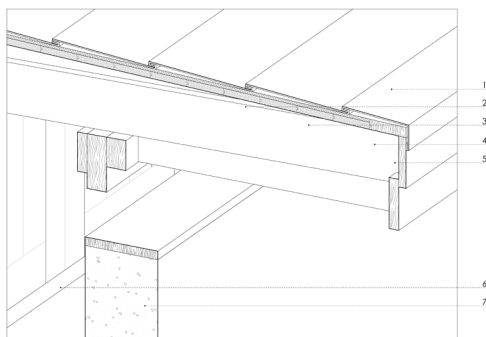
Didactic model of a detail of the Ocean Swimming Pool. Credits: The authors. 1– Bituminous membrane with copper coating; 2 – Waterproofing; 3 – Agglomerated cork, 1mm thick; 4- Wooden boards, 0.15 thick; 5 – Wooden structure; 6 – Concrete wall; 7 – Concrete slabs.
